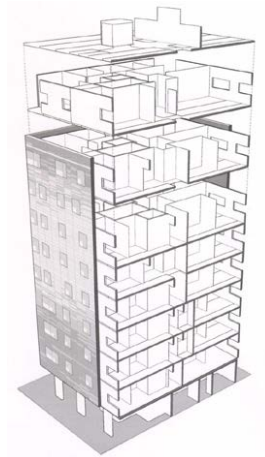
Isometric of Stadthaus Building. London, showing the closely spaced internal CLT walls
